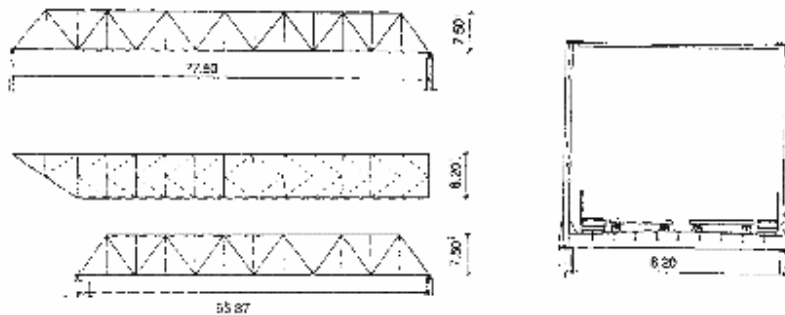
Structural system and cross section of the Anhalter-Bahn-Bridge in Berlin.
